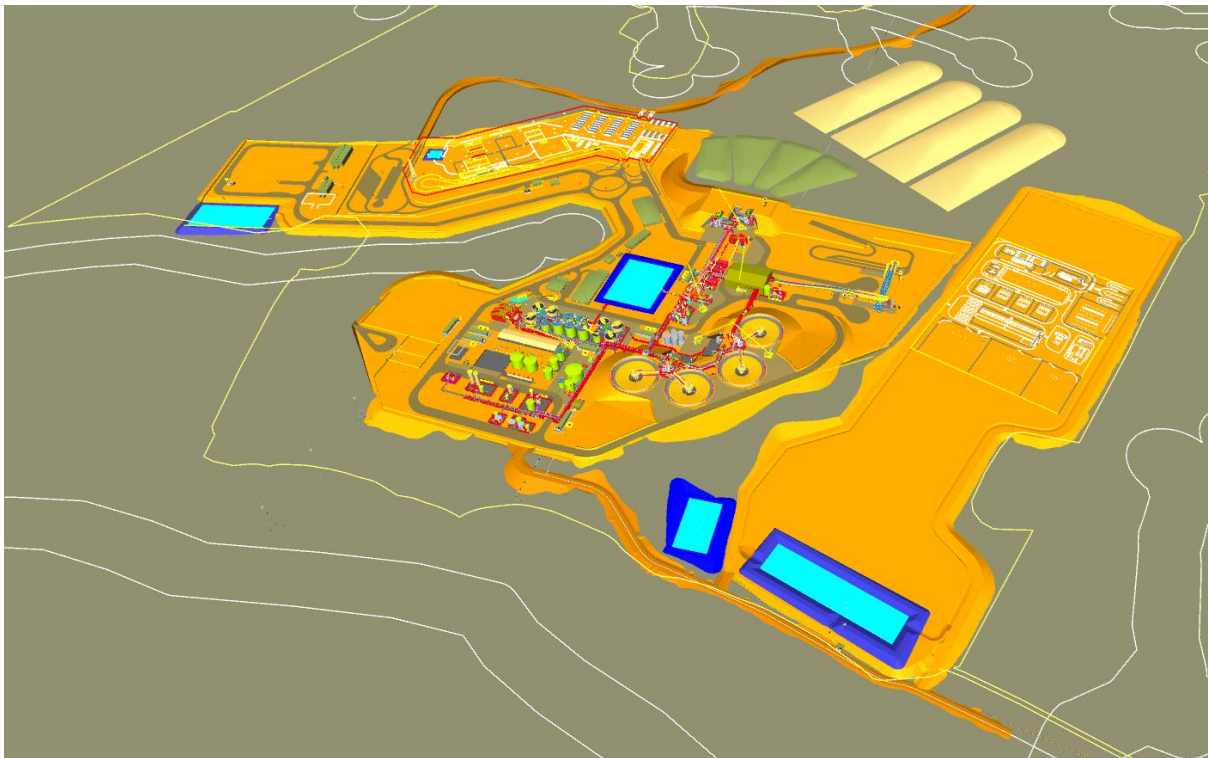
Model Extract showing Processing Plant Layout at Capão do Mel
